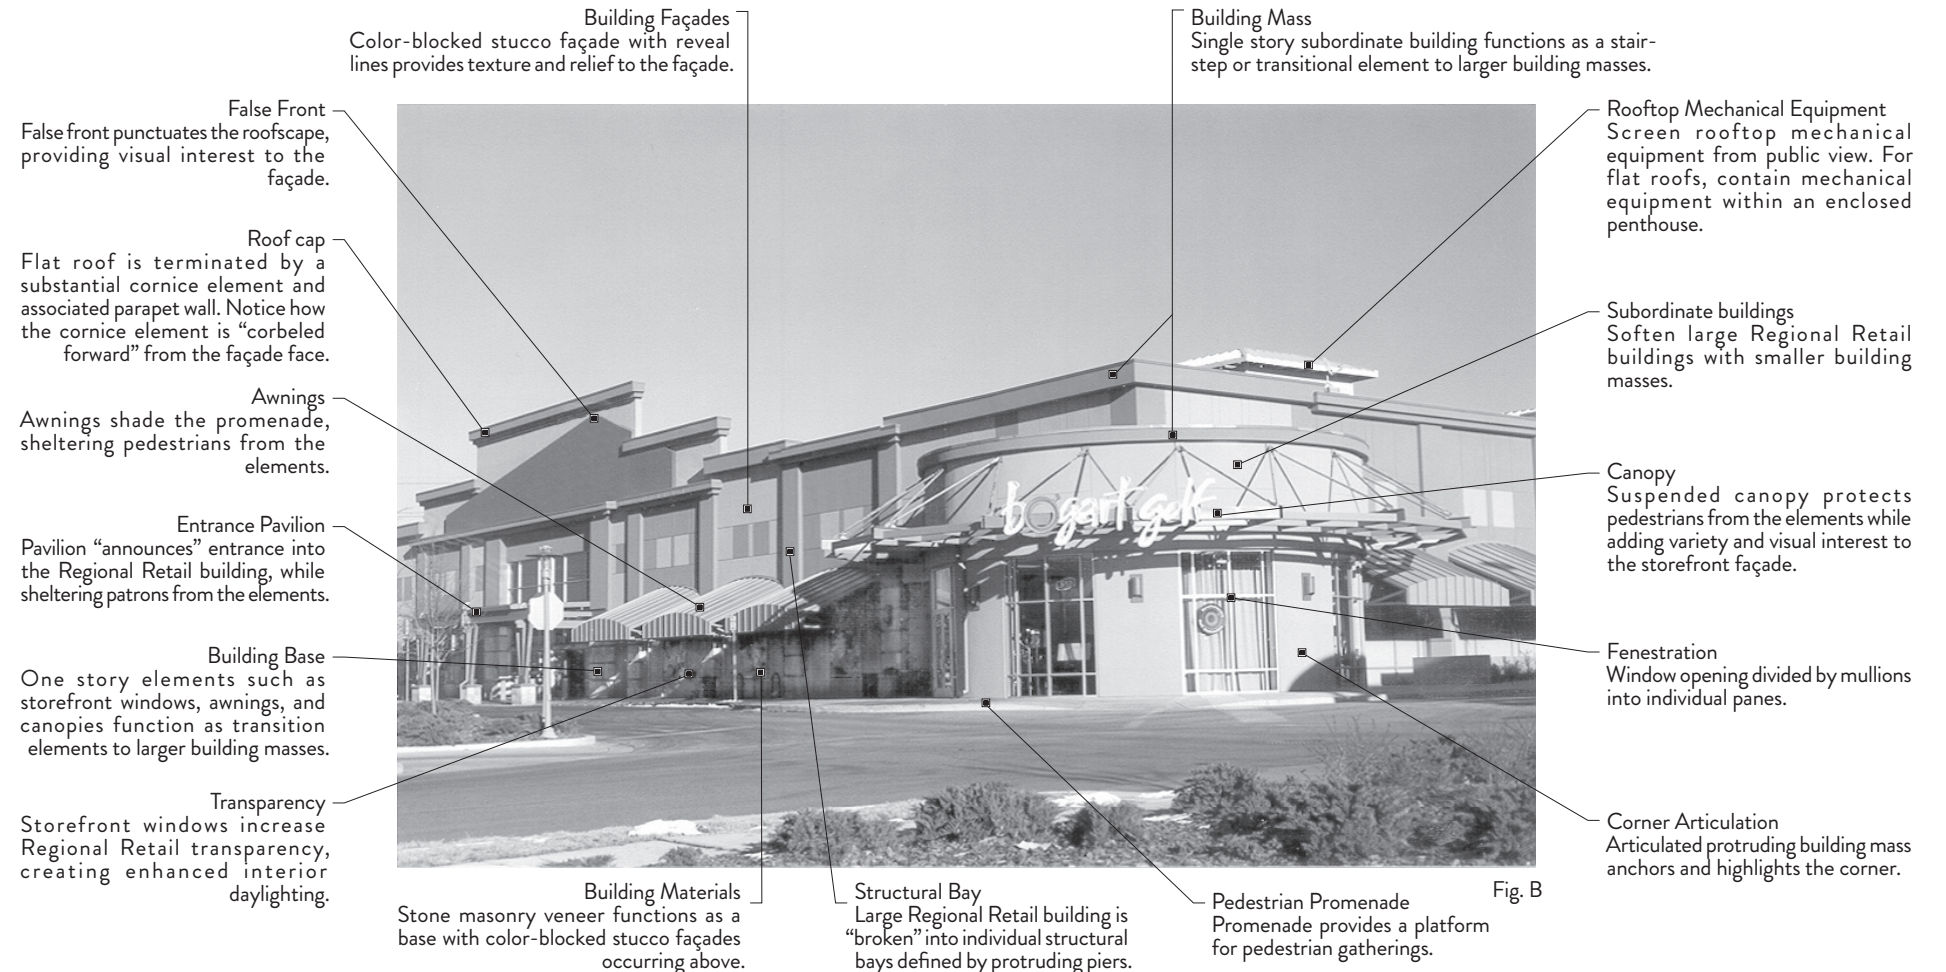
Terminate the top of flat roof buildings with a discernible roof cap. Use ample cornice elements and parapet walls to top the building.
